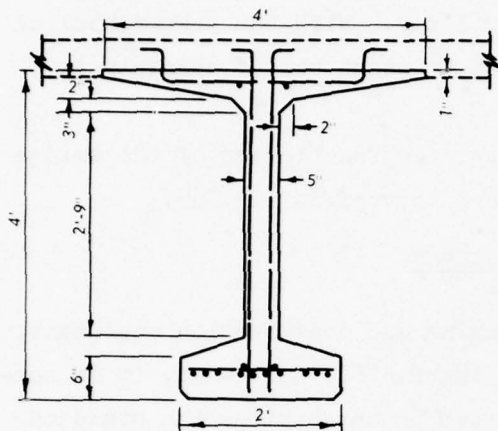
Precast, prestressed lightweight concrete girder section (from Reference 27)
